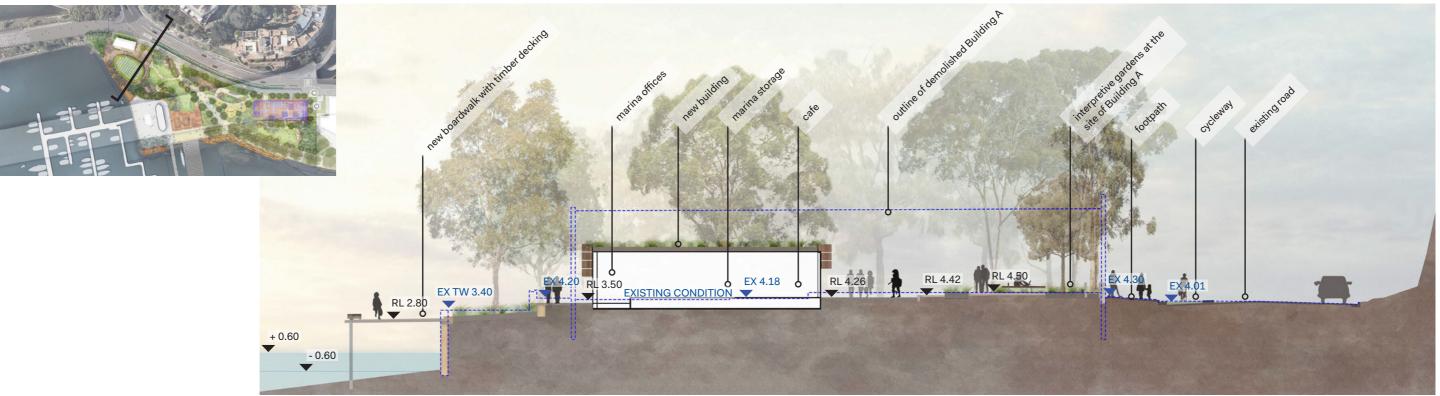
Section through demolished and new buildings, as well as through the new proposed board walk
